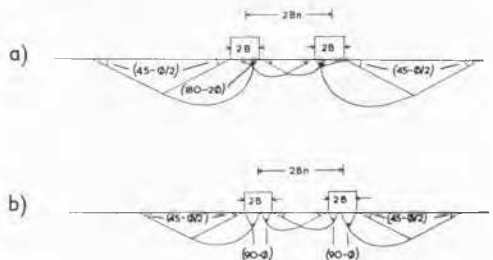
(a) Failure mechanism — rough foundation (Stuart).
